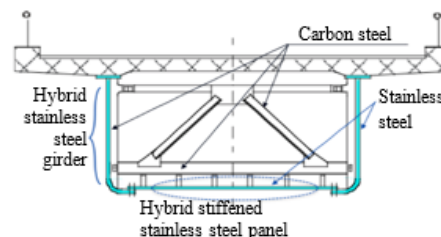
Basic geometry of hybrid stainless steel bridge girder
